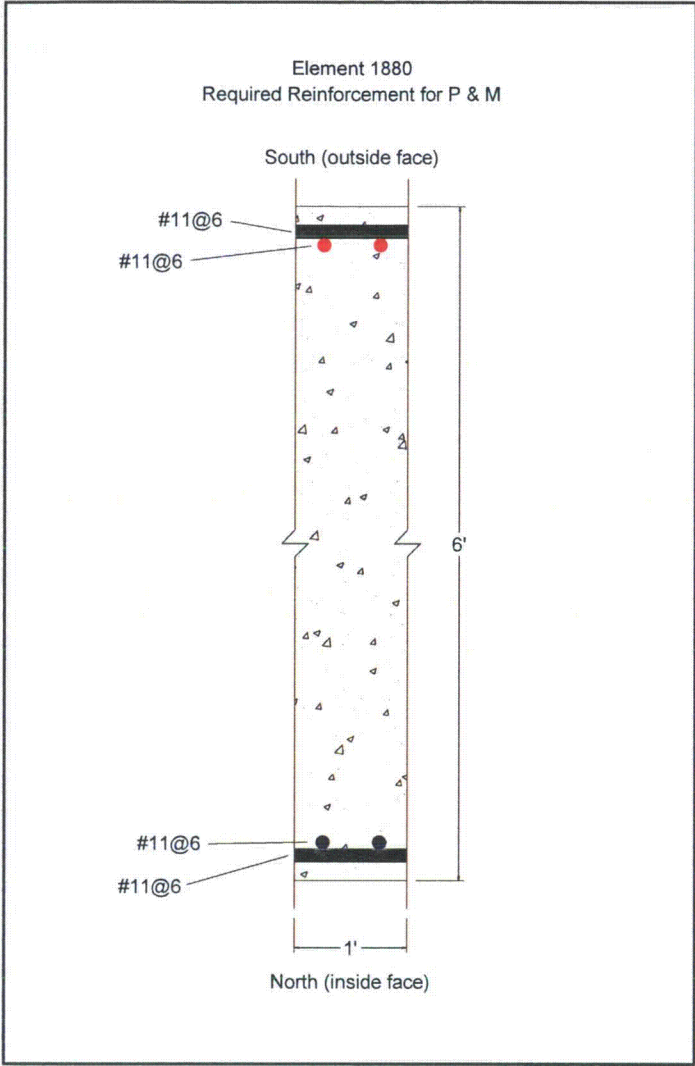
Cross Section of Wall with Reinforcement Required for P & M only
